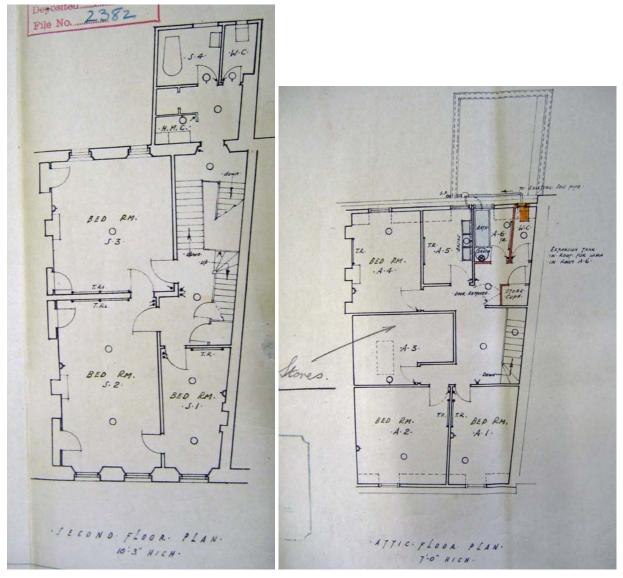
1950 Second and Attic Floor of proposed hostel at 9 Somerset Place by Ernest Tew (BRO: BC/7624 July 1950)
